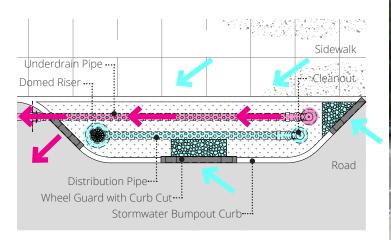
STORMWATER PLANTER COMPONENTS
